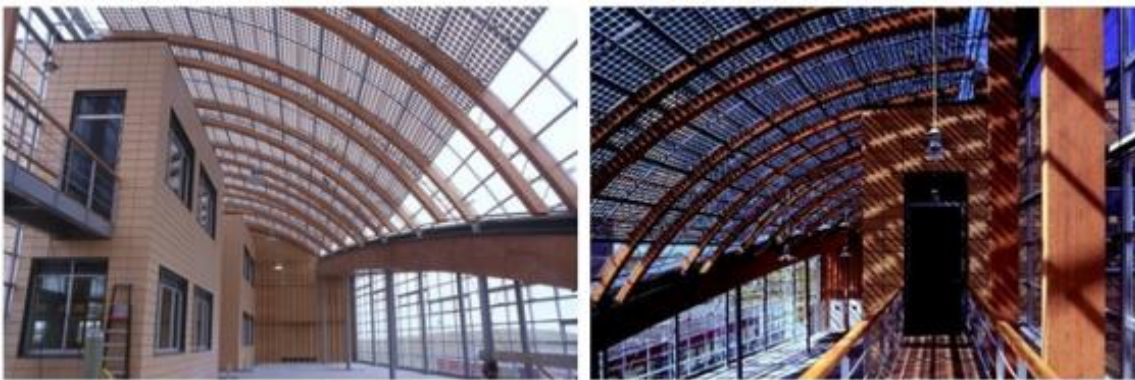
Timber beam solar canopy support structure, ECN Building, The Netherlands
